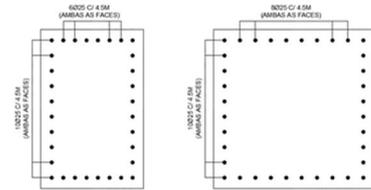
Columns longitudinal reinforcement (stirrups not represented)
